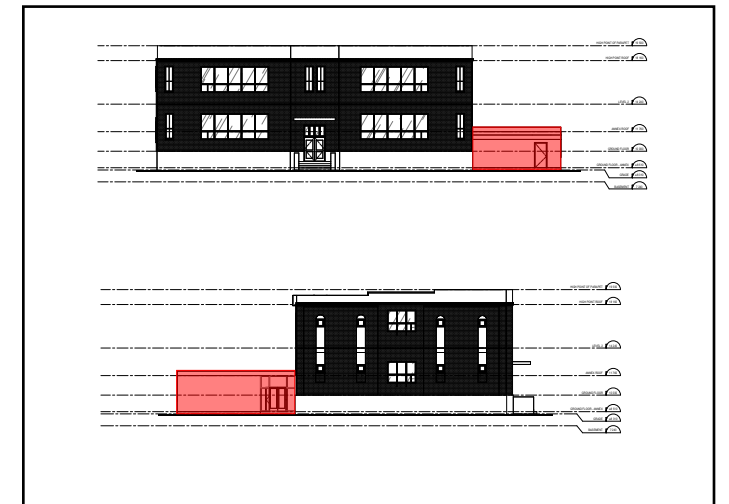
Southwest and northeast elevations of proposed demolition. EVOQ.
